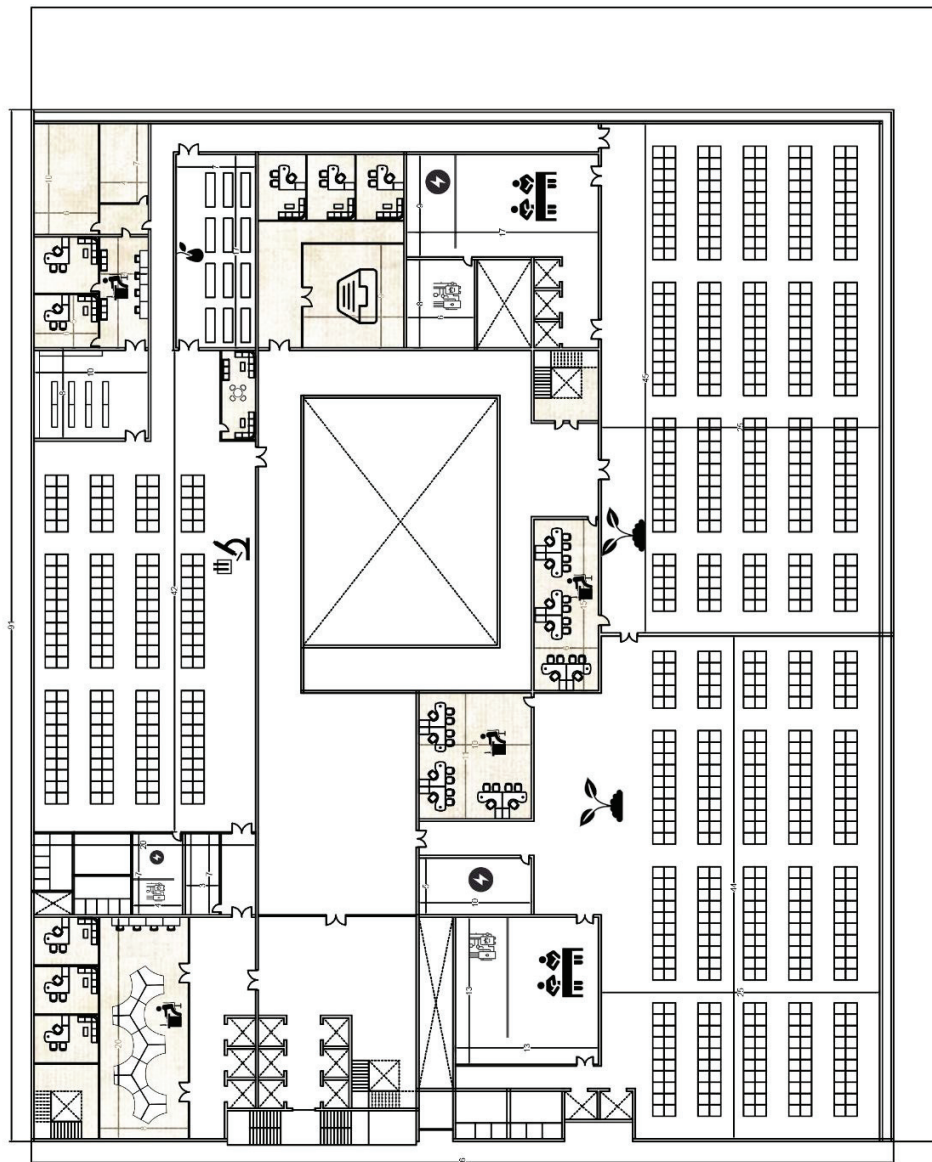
Typical Floor Plan, from 2nd floor upto 14th floor (Illustrated in Adobe photoshop)
